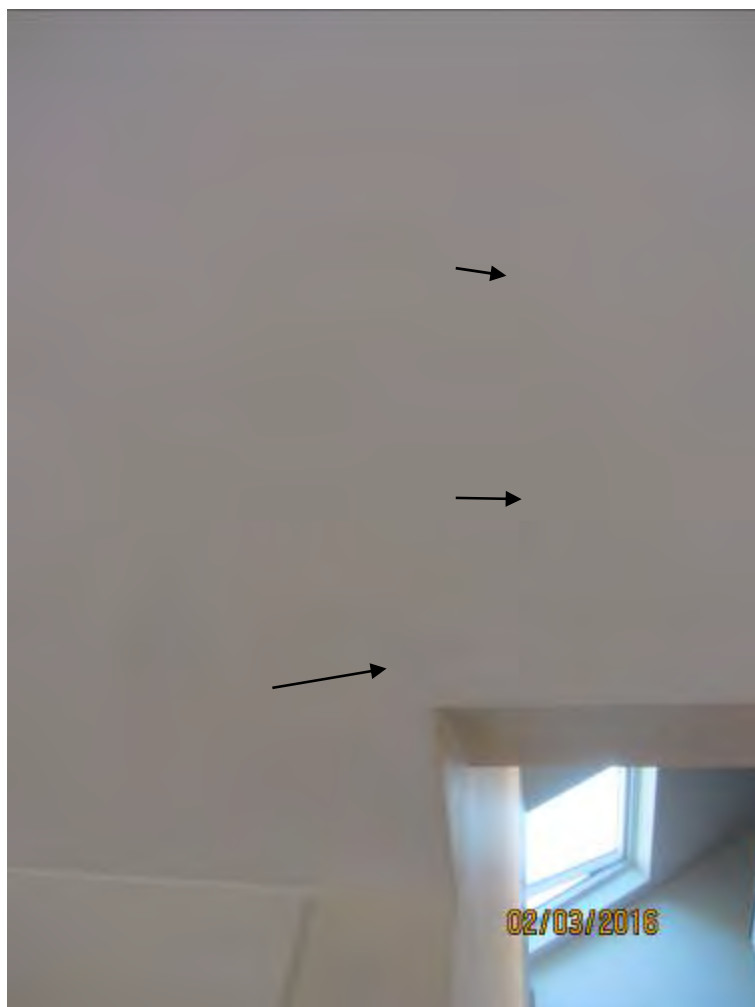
shows the hairline crack to the cornice to the southeast corner of Hallway 2
